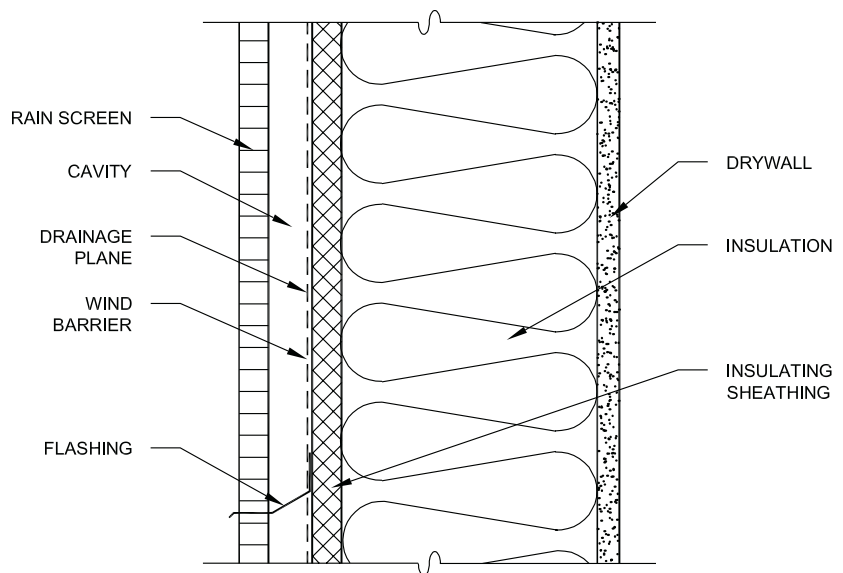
Every wall should have a drainage plane (drainage cavity) faced with a wind barrier to drain water that gets behind the rainscreen (siding, brick veneer, etc.).
